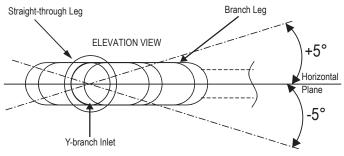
Diagram of an Incorrect Outdoor Unit Y-branch Installation.
